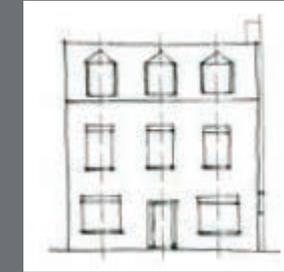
Dormer windows need to complement and align with the fenestration of the façade
